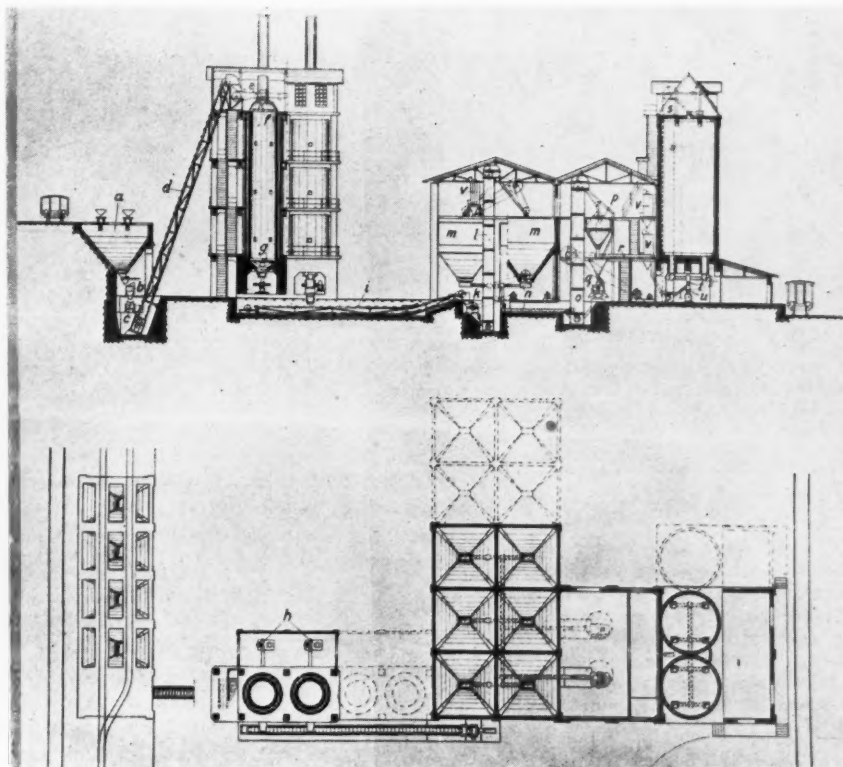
Plan and elevation of lime plant built by Curt von Gruber at Rudersdorf, Germany
